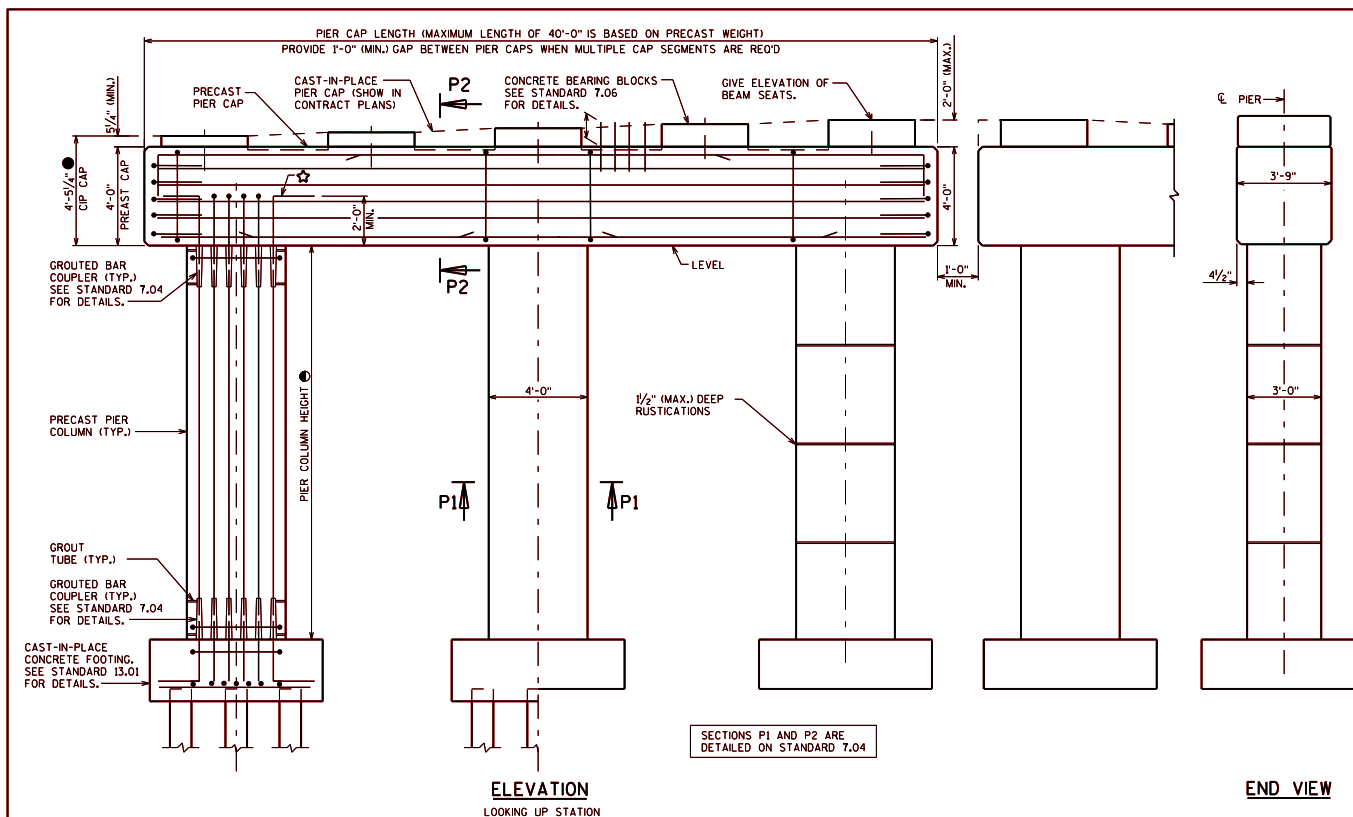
DETAILS AS SHOWN ON THIS STANDARD ARE INTENDED FOR REQUIRED PRECAST PIERS DESIGNED TO MEET PROJECT SPECIFIC REQUIREMENTS. SEE 7.1.4.1.2 IN THE 'BRIDGE' / 90 MANUAL AND STANDARDS 7.05 AND 7.06 FOR ADDITIONAL GUIDANCE. ALTERNATIVES TO CAST-IN-PLACE PIERS: SEE 7.1.4.1.2 IN THE BRIDGE MANUAL AND STANDARDS 7.05 AND 7.06 FOR ADDITIONAL GUIDANCE.
